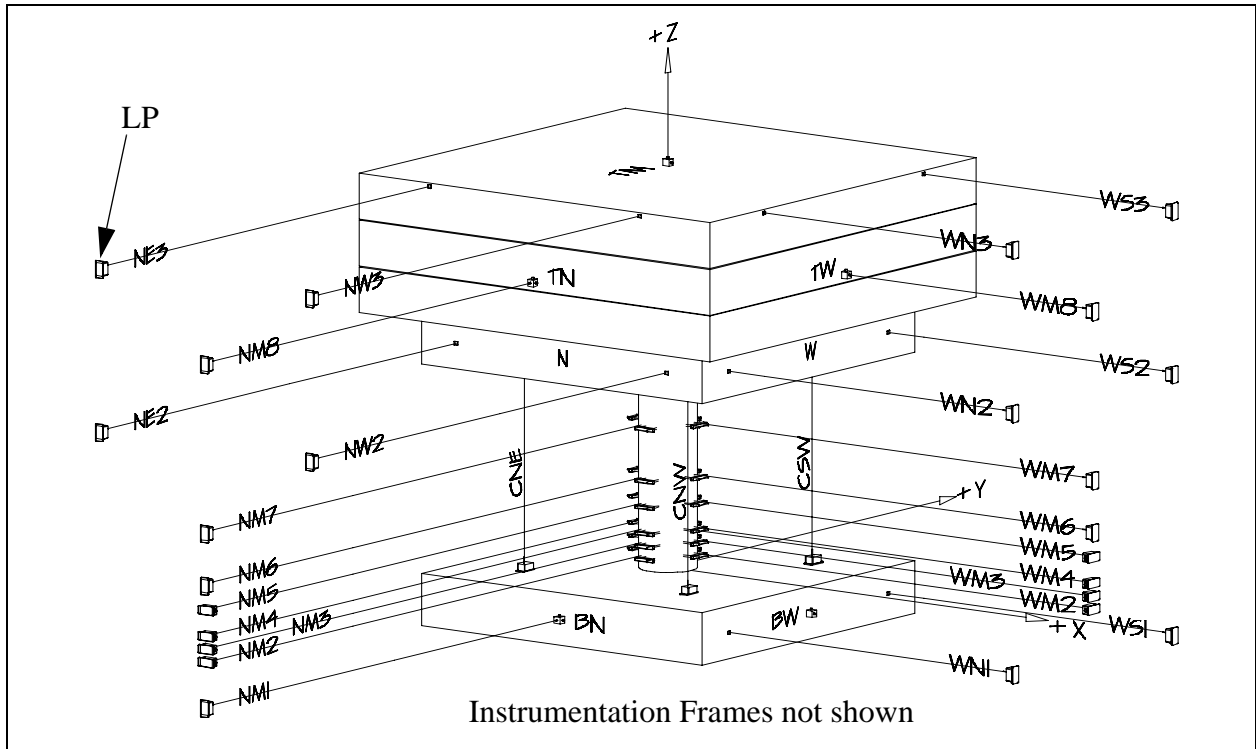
Details of the instrumentation along the elevation of the specimen.
